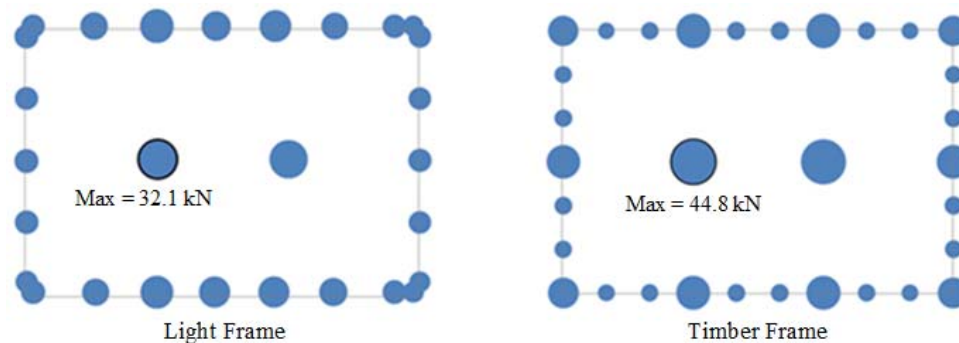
Fully-enclosed light-frame and timber frame foundation reactions, ASD load combination 4
